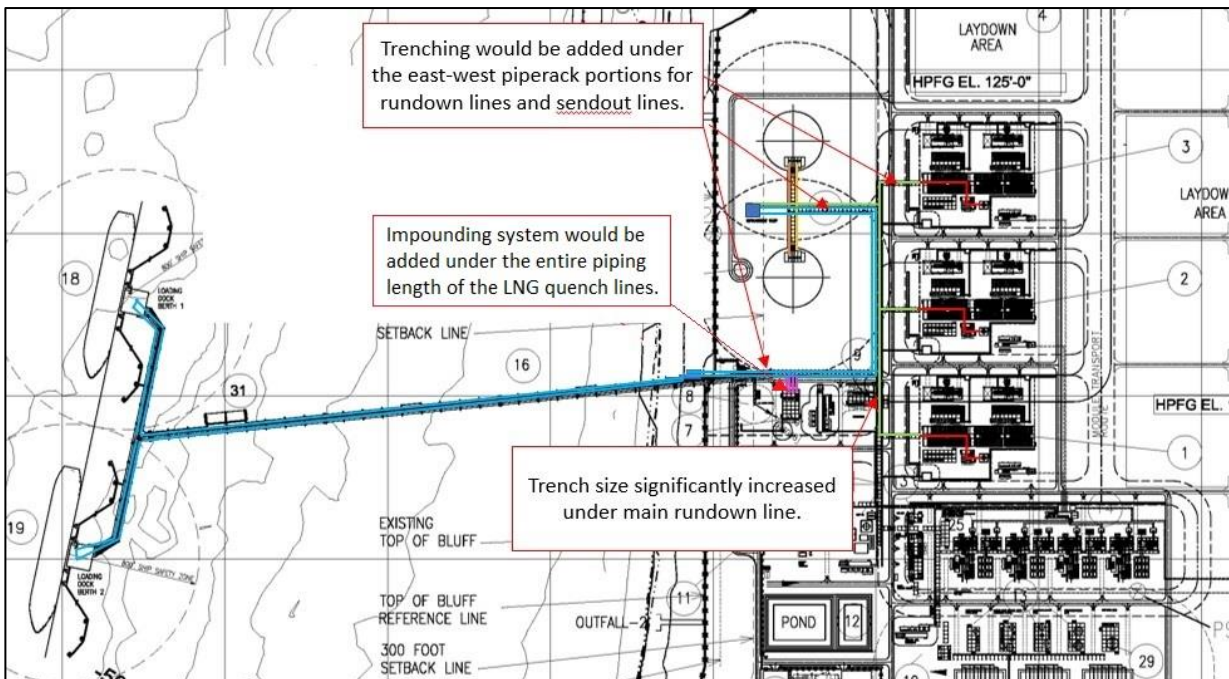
Conventional Pipe-in-Trough (PIT) Layout
